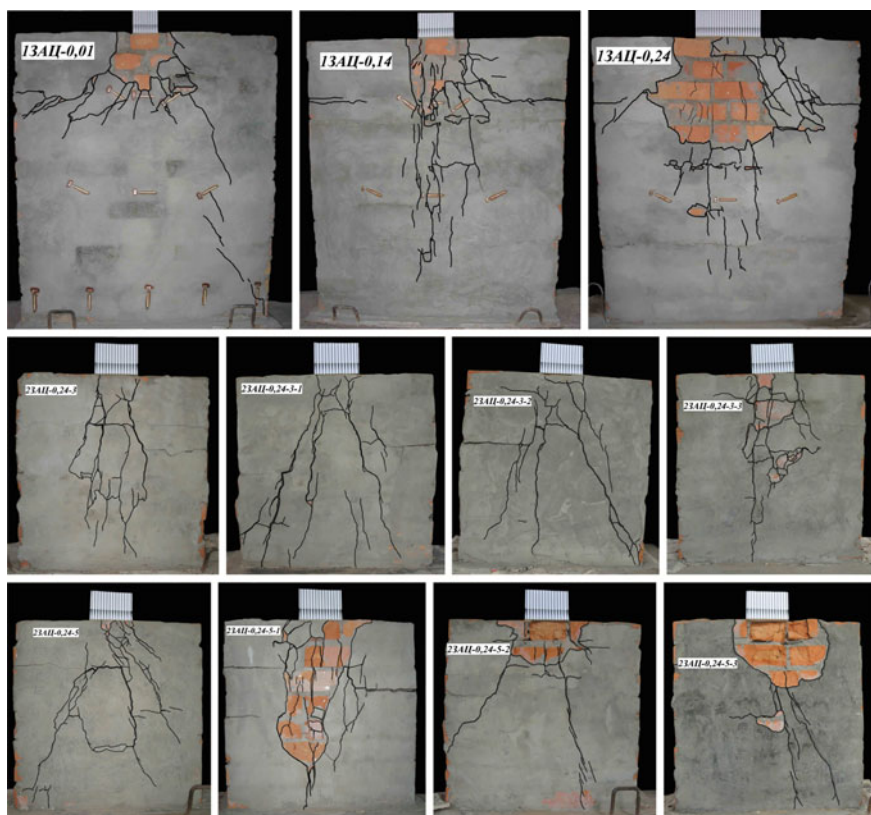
Nature of the reinforced masonry specimens destruction under central local compression
